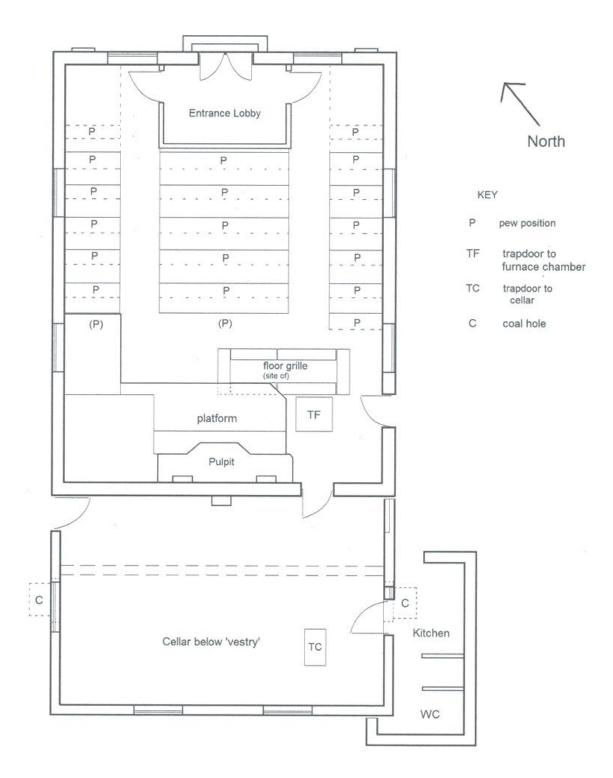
Wroot Wesleyan Chapel (WRTAF): Ground Plan Scale 1:100
